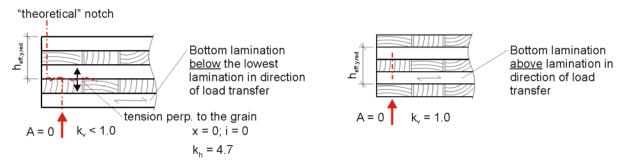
Left – partly supported edge – edge perpendicular to the cover layers Right – partly supported edge – edge parallel to the cover layers
